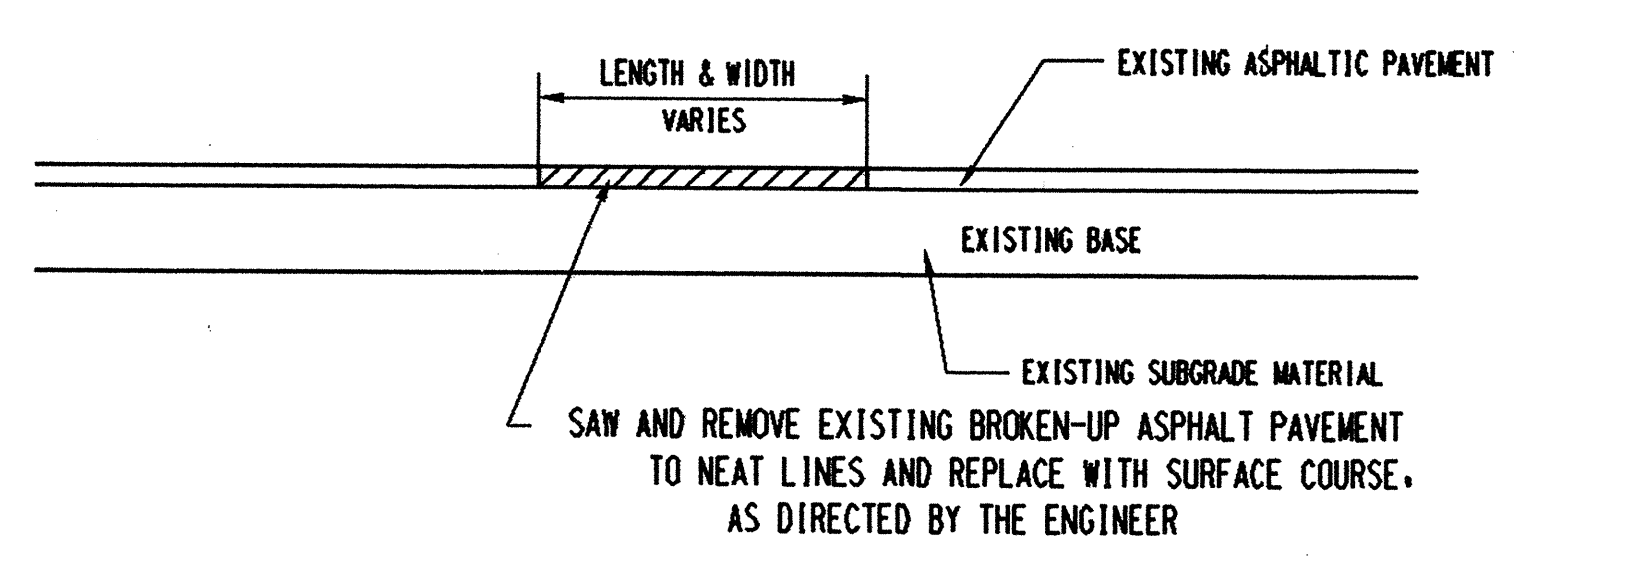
DETAILS OF REPAIRING EXISTING PAVEMENT PRIOR TO RESURFACING FOR FULL DEPTH AND MILLING
